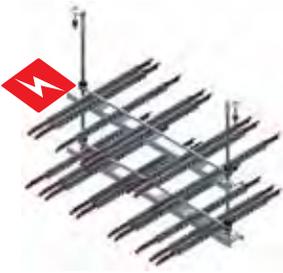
Stiffy HD 2-Tier Crossbar Trapeze
